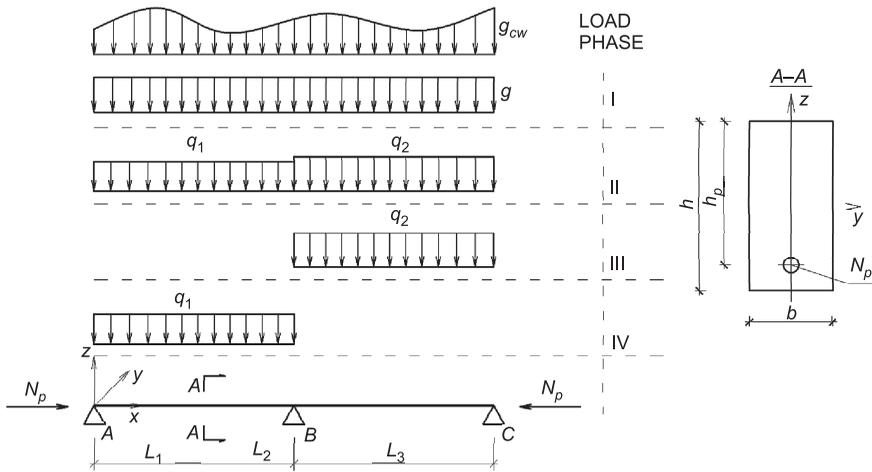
Static diagram, cross-section and configuration of external forces for a double-span beam
